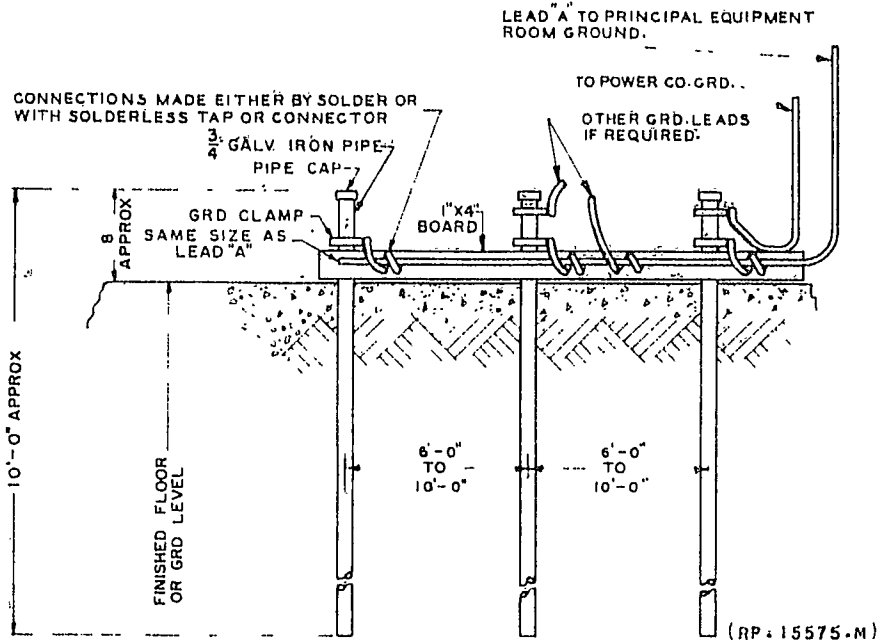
TYPICAL ARRANGEMENT OF GROUND LEADS TO PIPES DRIVEN IN BASEMENT (PAR. 5.31)
